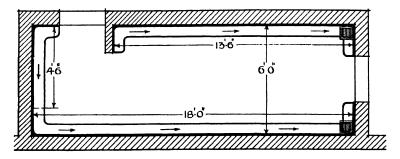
Plan of 'London-type' urinal for elementary school of 350 boys Walls and floor rendered with mastic asphalt.
